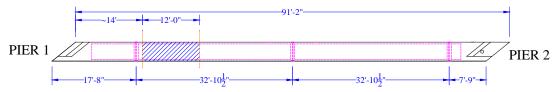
Plan View of Span 2 Beam 16 of Lakeview Drive Bridge
